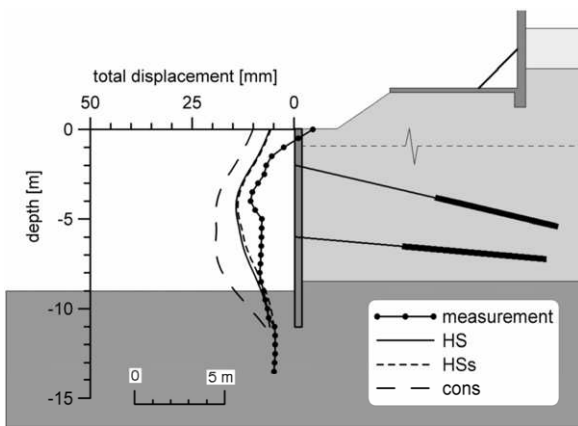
Anchored retaining wall No. 2 at site A: layout and horizontal displacements
